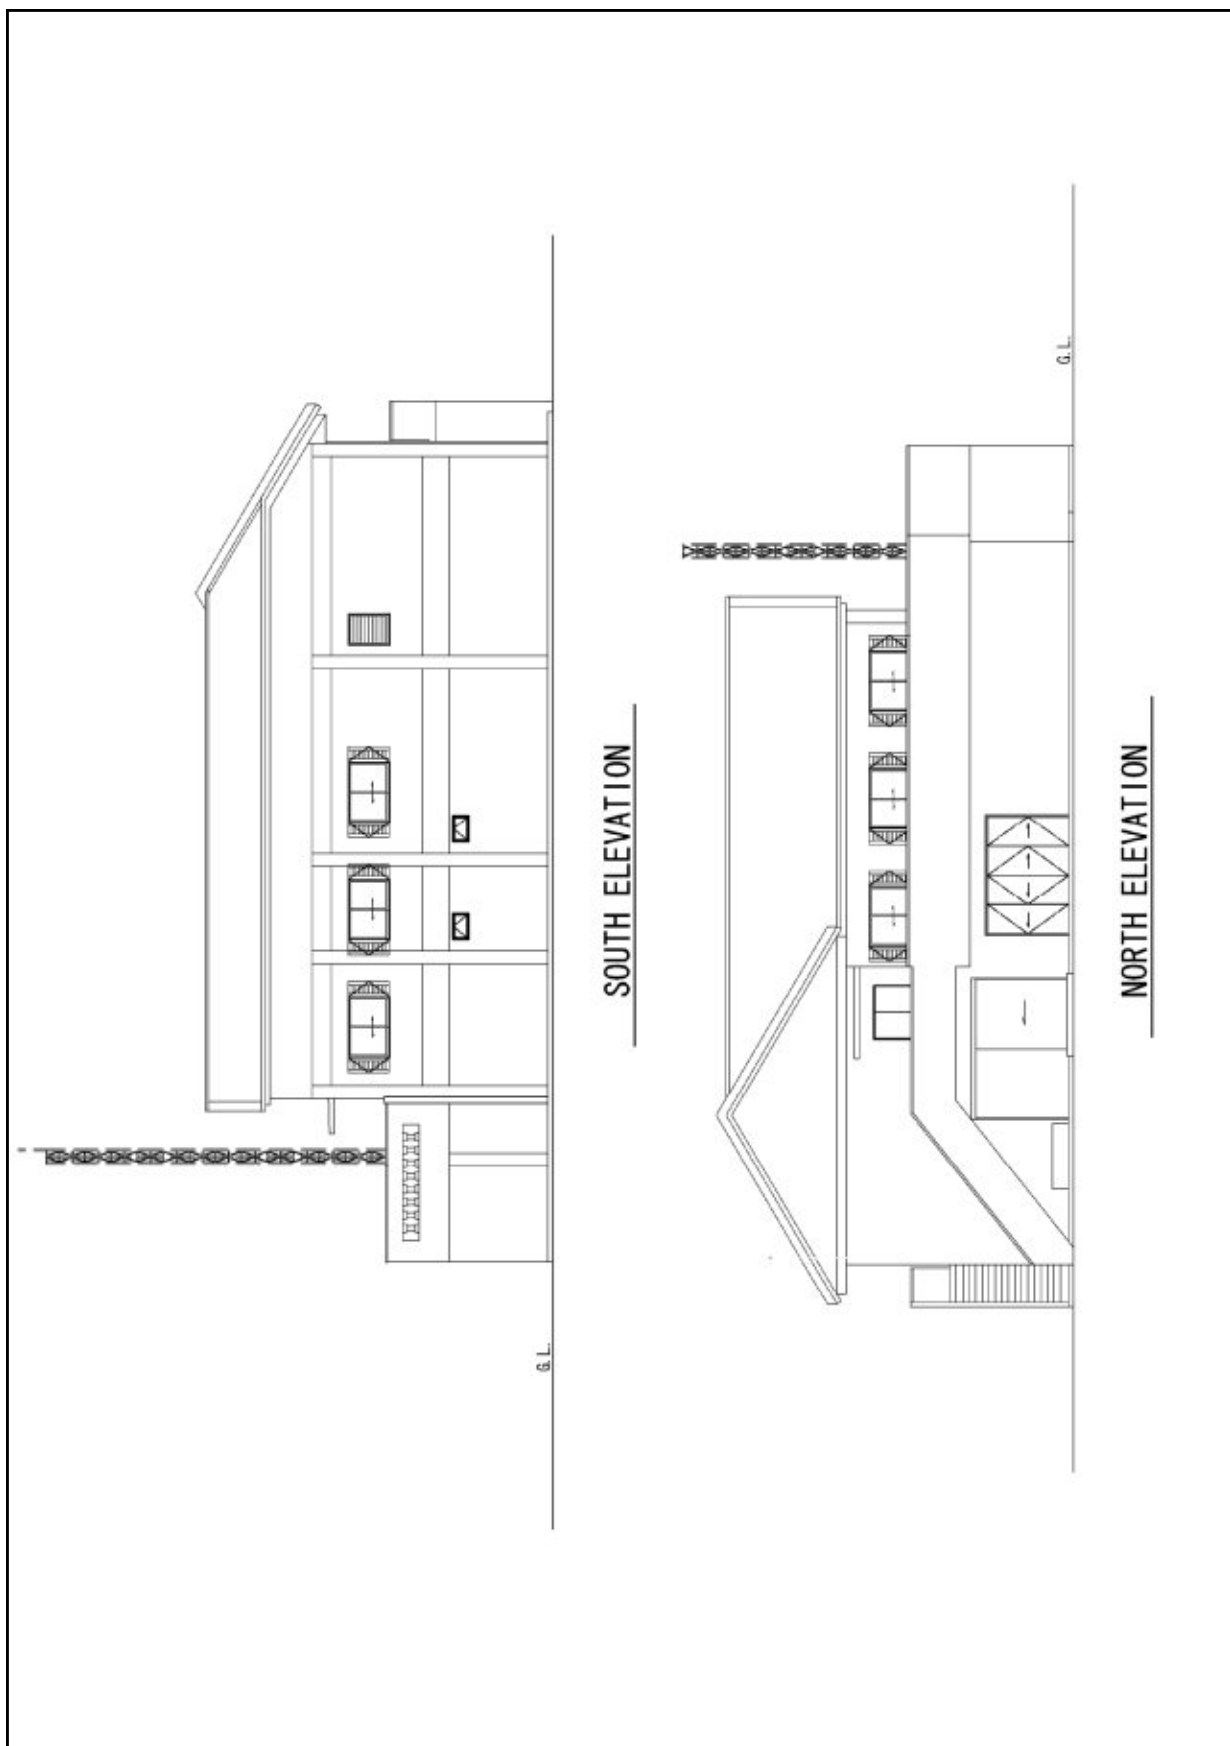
(17) Elevation Plan of New Fisheries Center (North, South)
